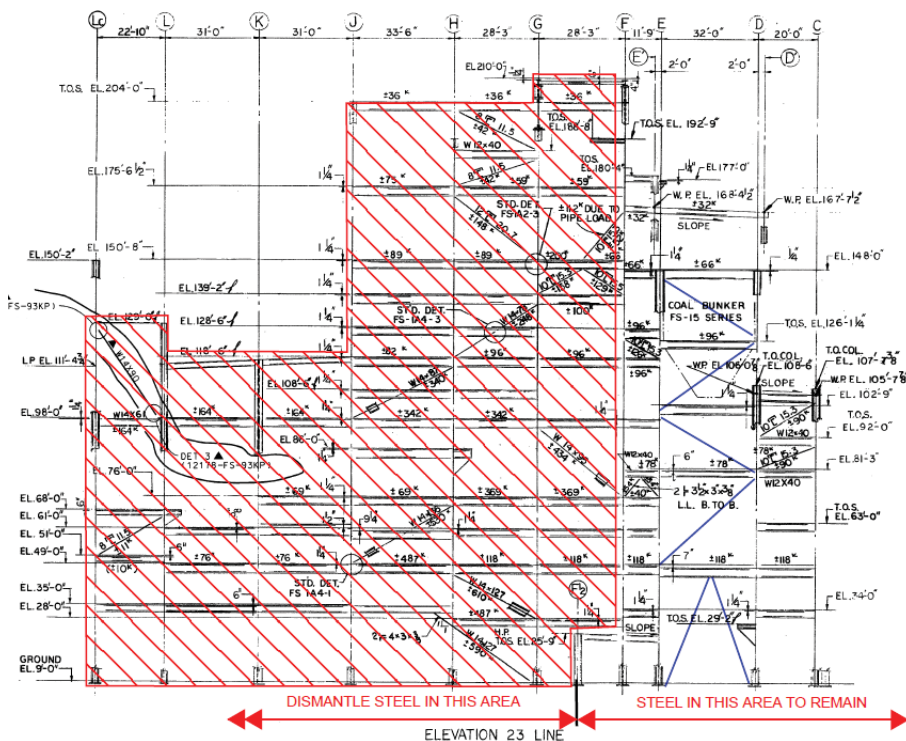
New Vertical Bracing and Boiler Steel Demolition
